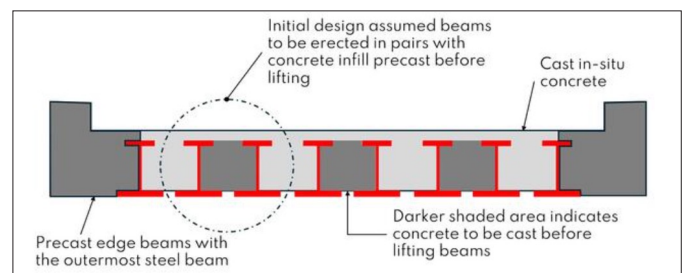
Cross section through the bridge deck as designed showing pairs of beams with concrete precast before lifting. Note that this is not the final design which included bracing.
